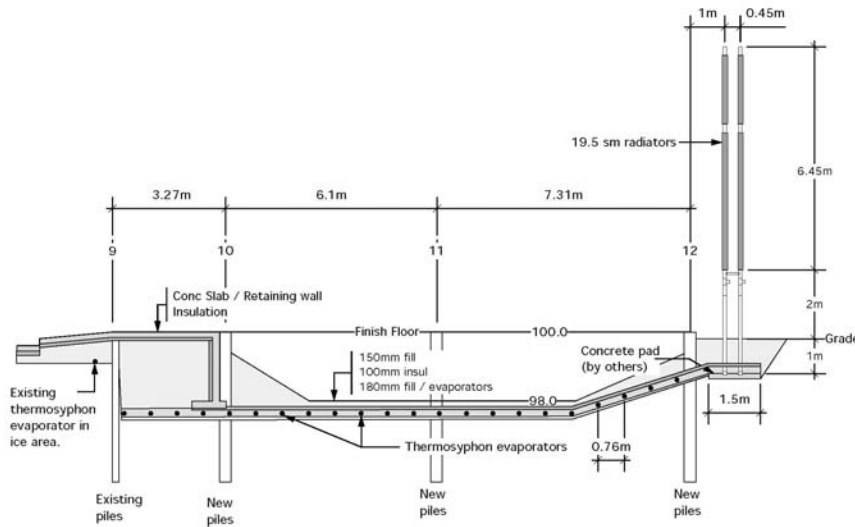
Foundation section at the building addition, Dawson City ice rink (Arctic Foundation).
